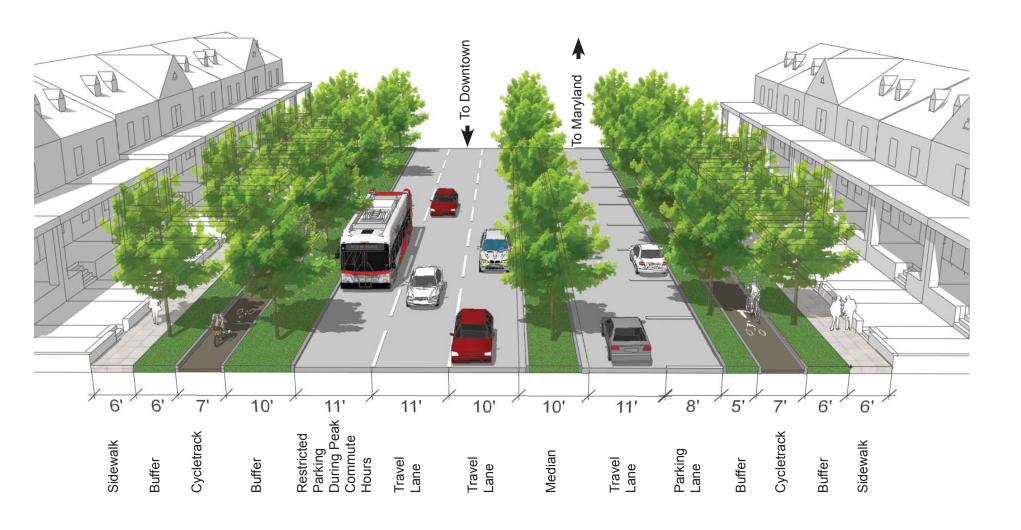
ALTERNATIVE B TYPICAL SECTION
